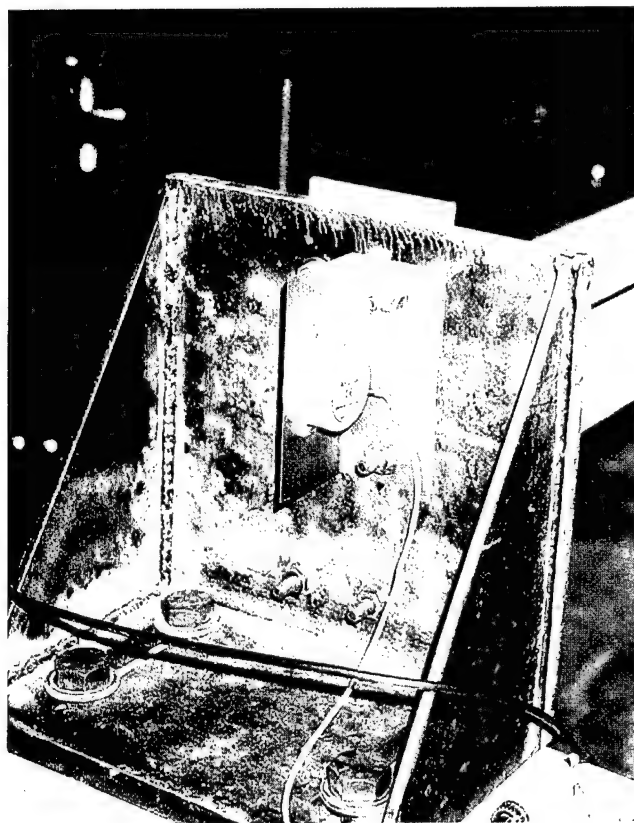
Welded steel angle with triangular welded side plates.
